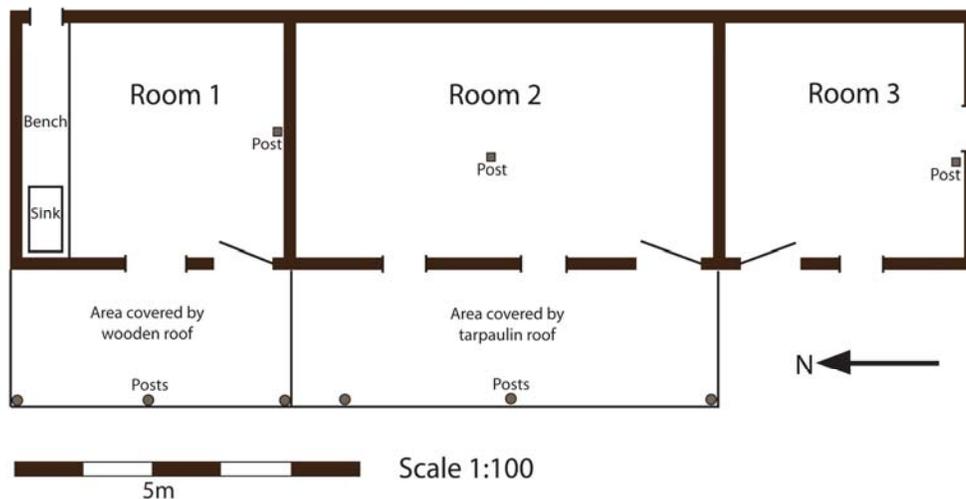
Floor plan of the chicken shed. Plan Eddisford & Morgan
